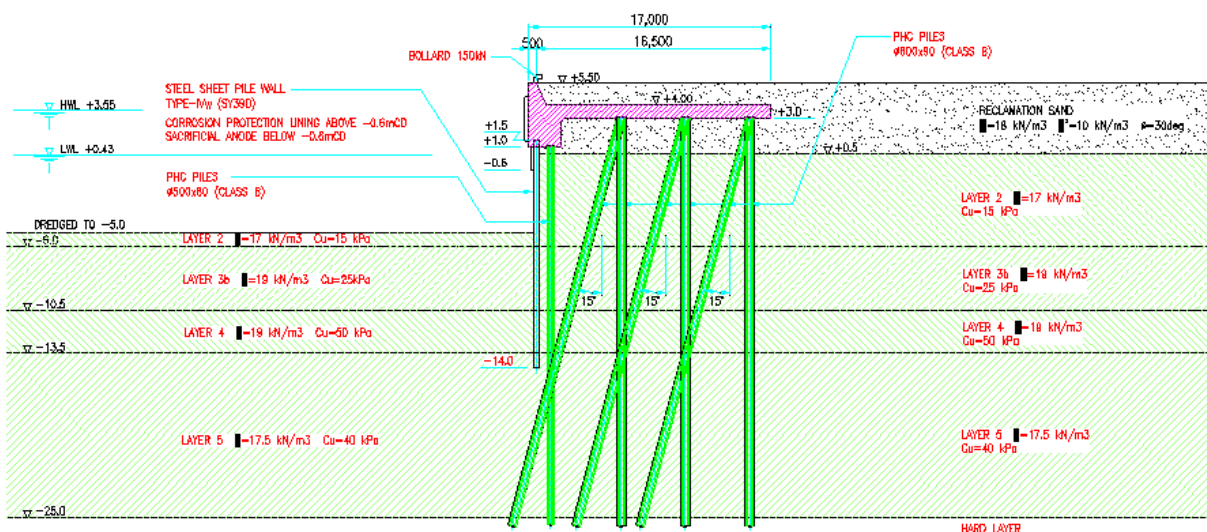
Typical Cross Section of Service Boat Berth
